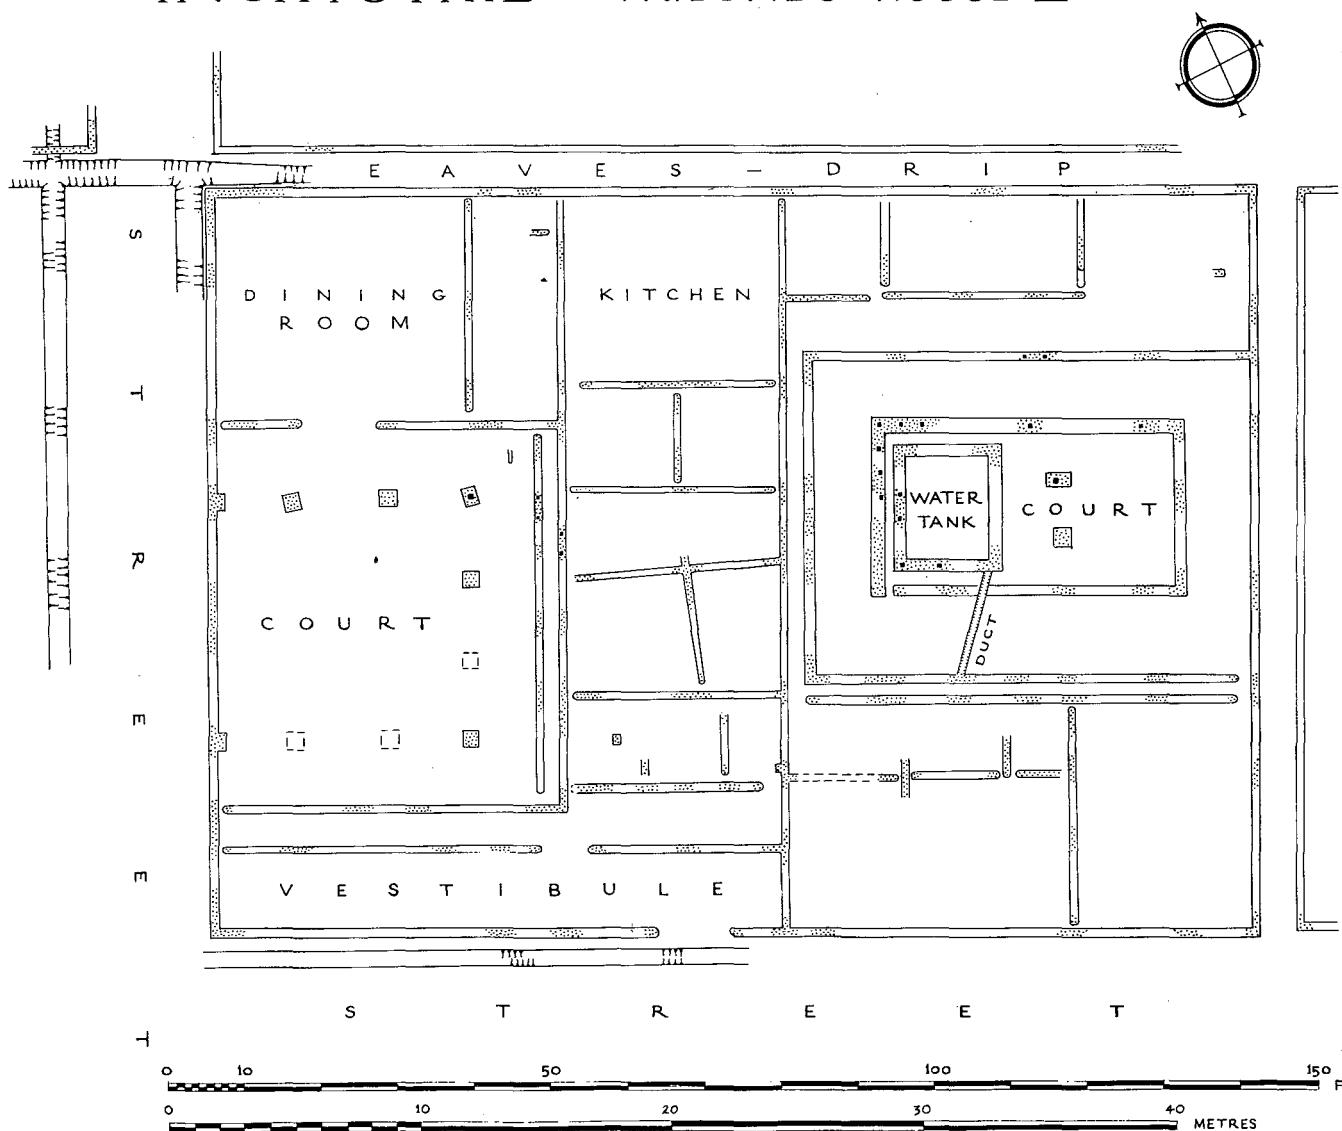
Tribune's House No. II, plan. Scale, 1:300.
